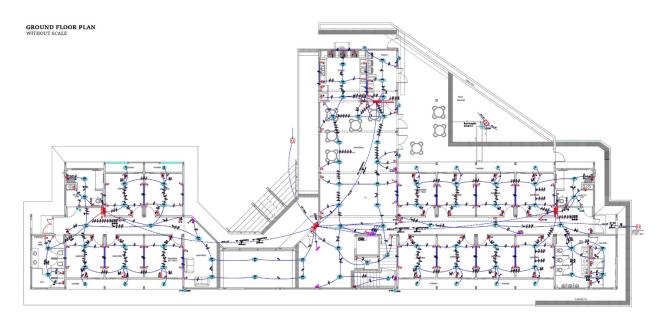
Ground Floor Electric Plant of Original Design in dwg Format (Source: USP São Carlos Campus City Hall, 2019).
